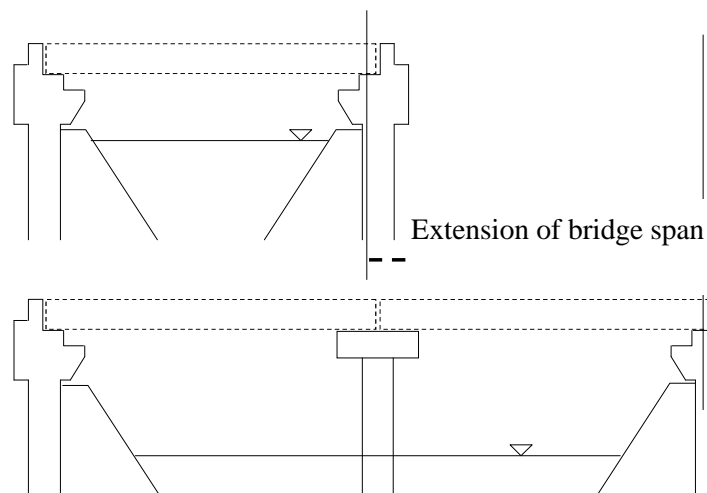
A case where obstruction ratio of the cross-sectional area is improved by extending the bridge span (District No.18)
